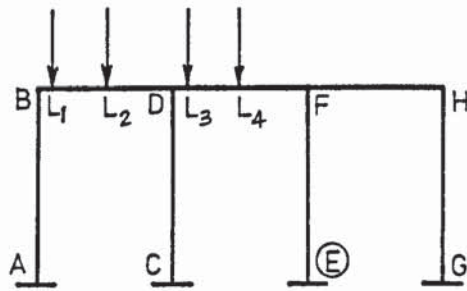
SETTLEMENTS OF FOUNDATION OF MODEL D2 WITH STRIP FOOTINGS
